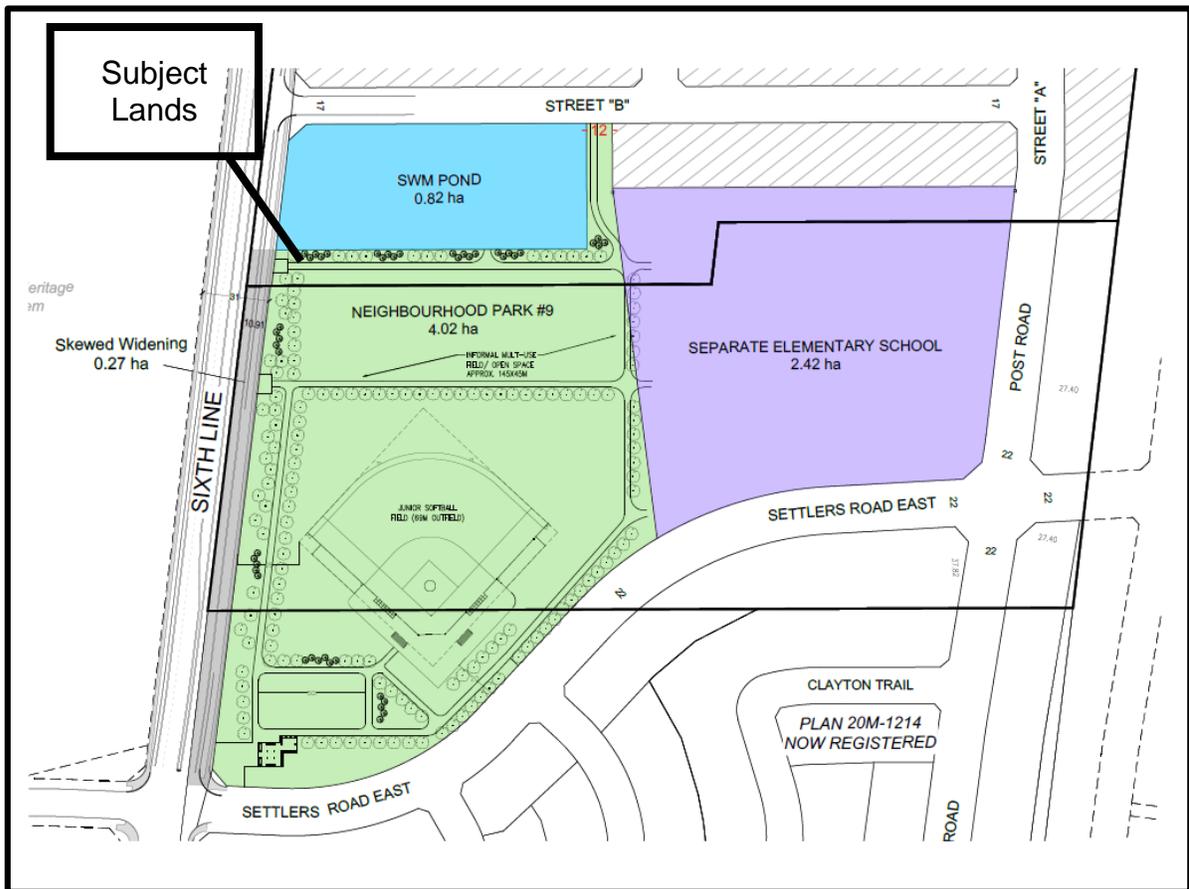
Proposed Park and School Block sizes (Park concept subject to change)
